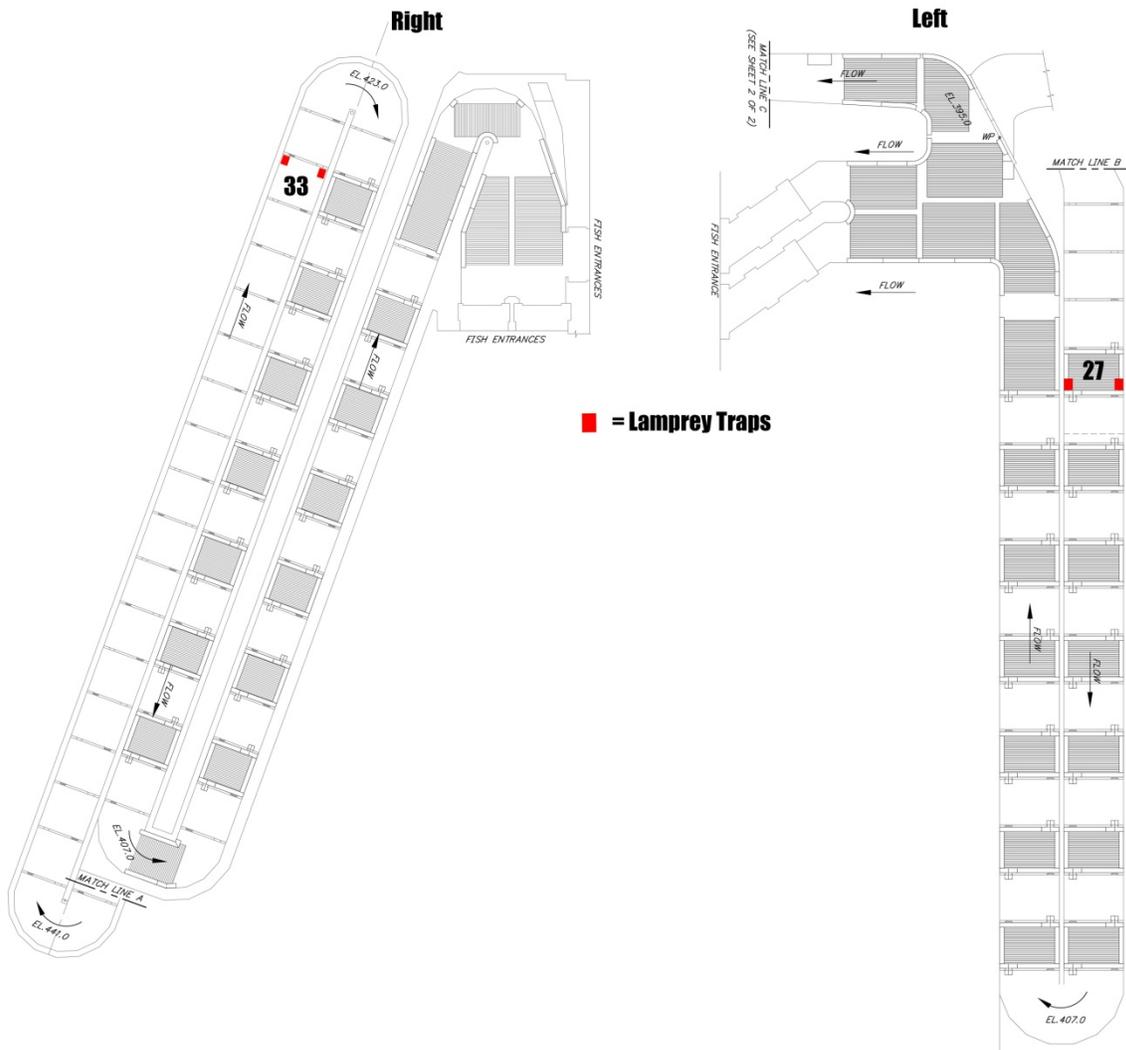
Location of lamprey traps at Priest Rapids Dam.
